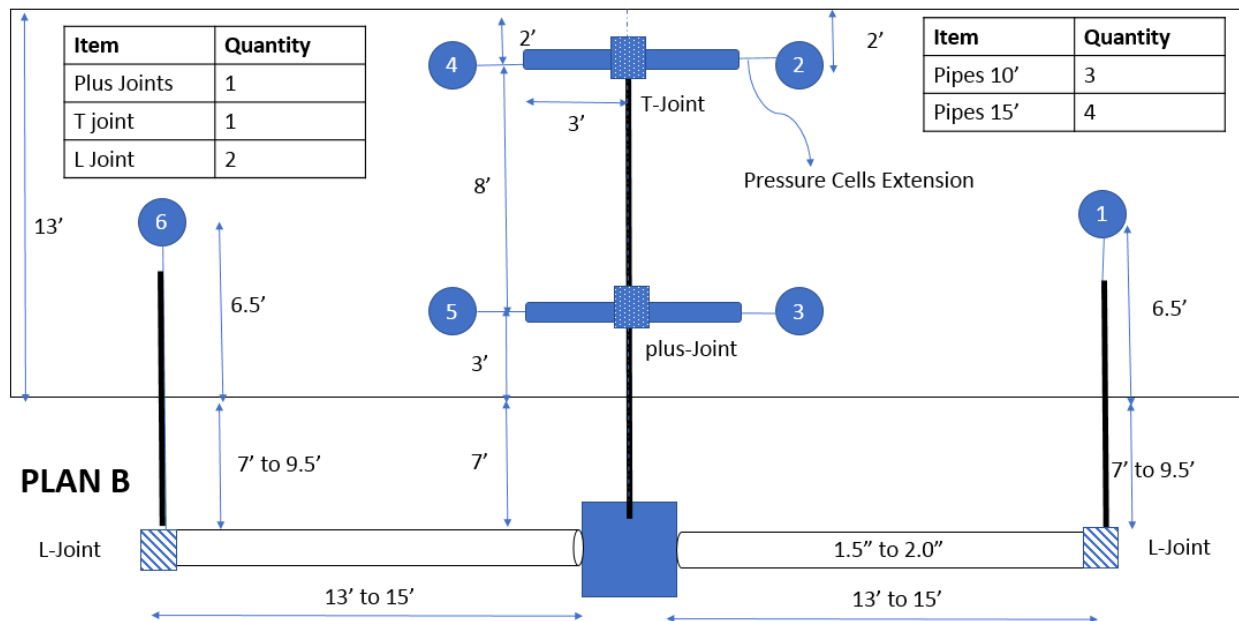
Wiring Arrangement at FM 906 at Testing Site for Geocell Reinforced Section.
